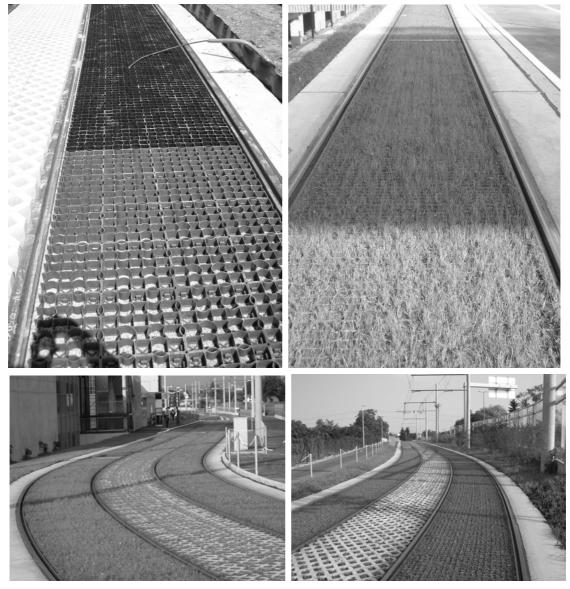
Grass pavers. a) Paver elements; b) Finish detail; c&d) General view of the track. Courtesy of *Element-s Bauelemente & Bodensysteme*.
